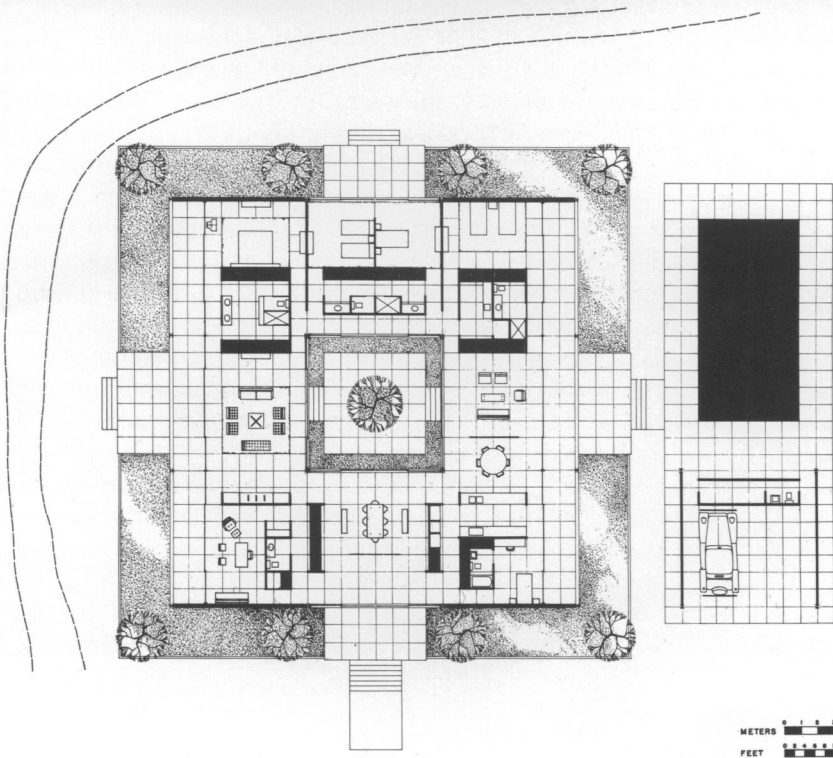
Pierre Koenig, Case Study House 21, Los Angeles
